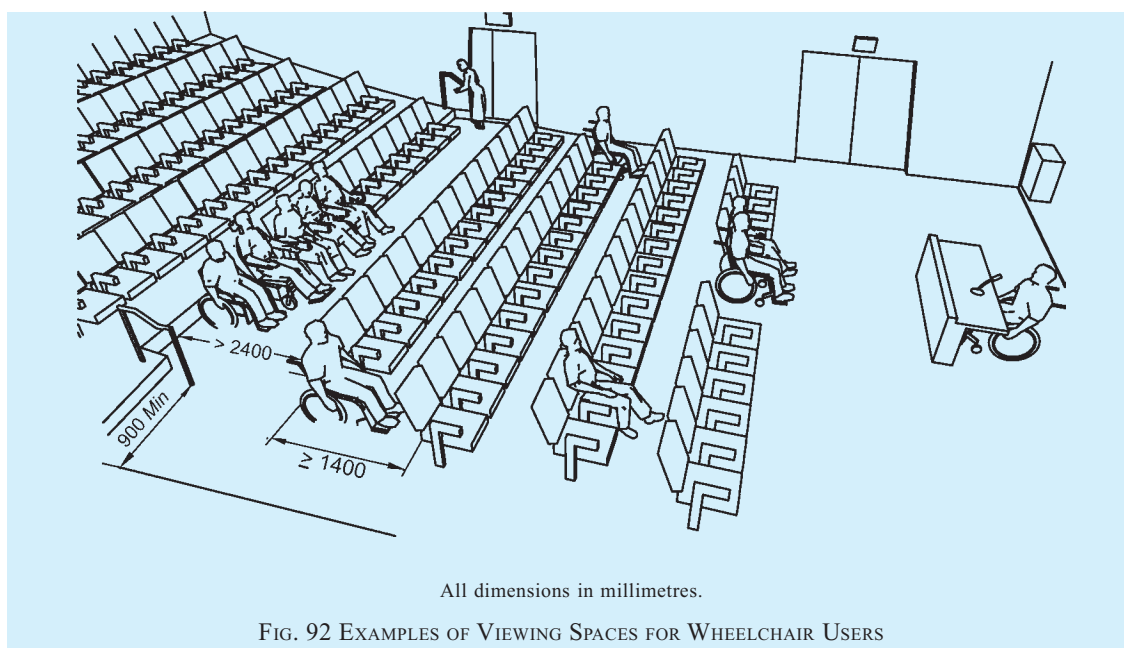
EXAMPLES OF VIEWING SPACES FOR WHEELCHAIR USERS
